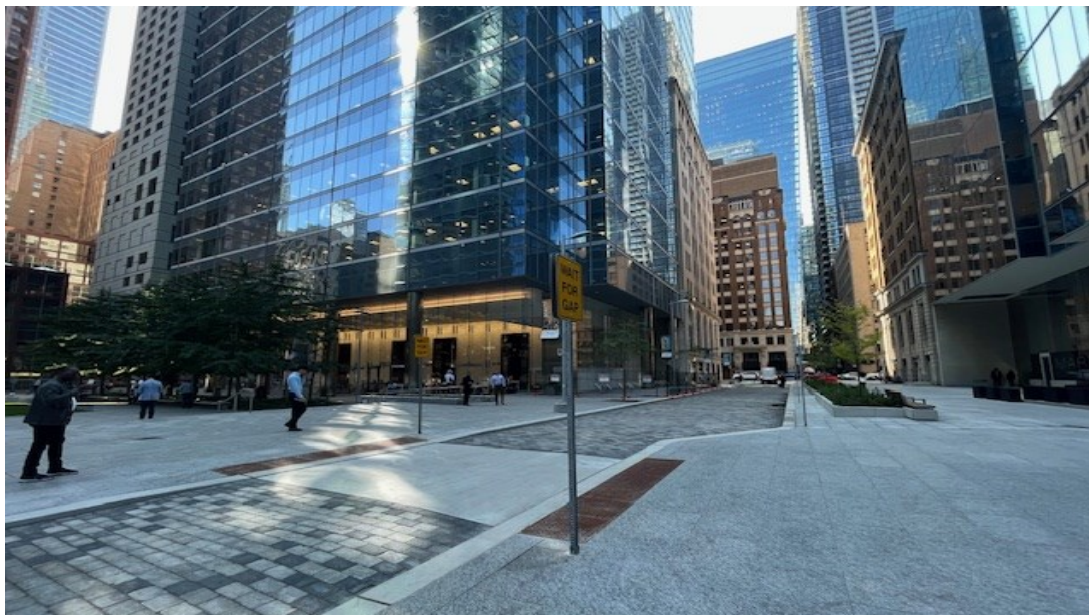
Example of curb extension at the mid-block pedestrian crossing connecting Arnell Plaza to Cloud Gardens at Temperance Street, City of Toronto.
